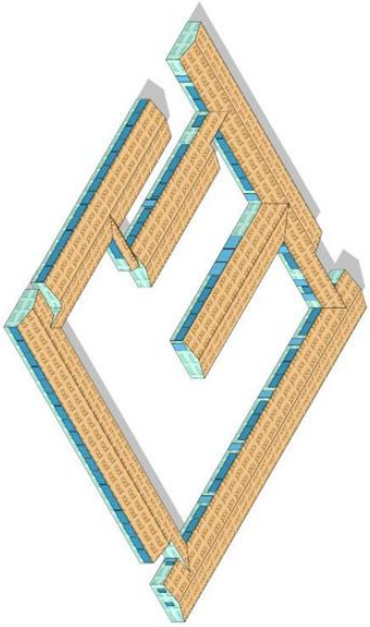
Image of geometry SketchUp model showing the roof, wall, and window components. Source: (Authors, 2021)
